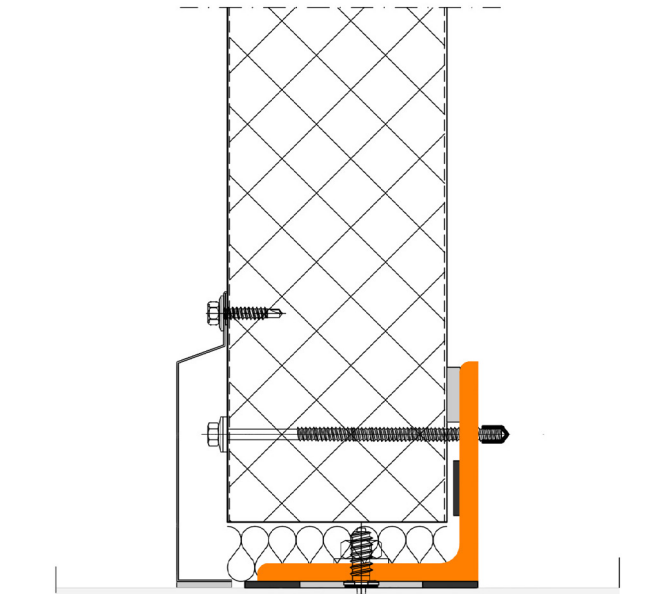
Studbolt detail for non-welded secondary steel A60 certified. For internal Generation IV sandwich wallpanels only.
